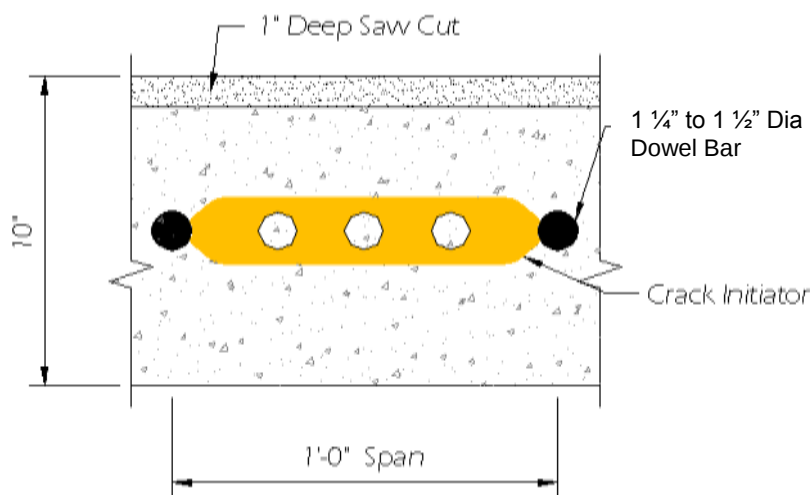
Cross sectional view of pavement slab showing a crack initiator attached between two dowel bars
